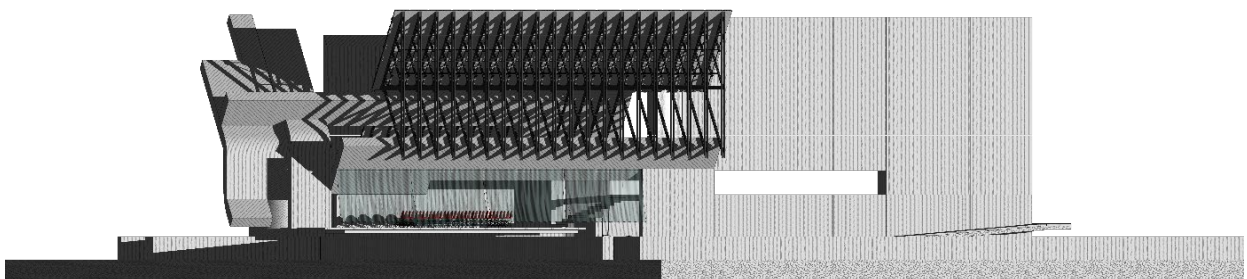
Hideaway Park Folly, True North Elevations, by Author
